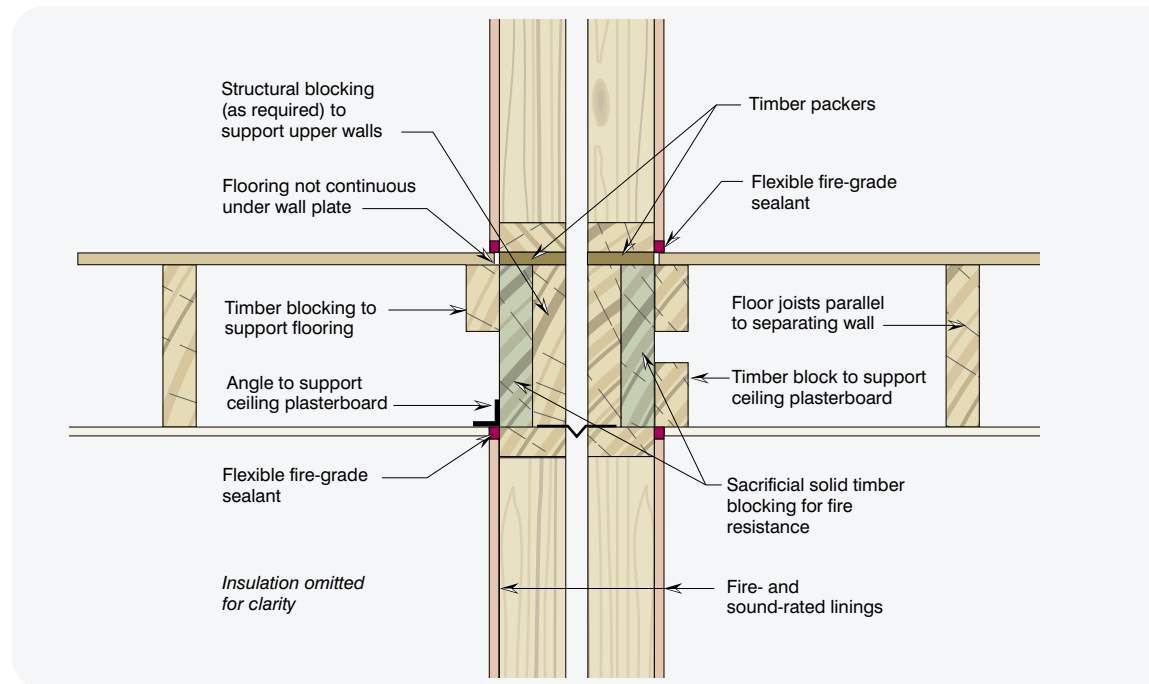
Discontinuous floor sheet under separating wall – elevation view.
